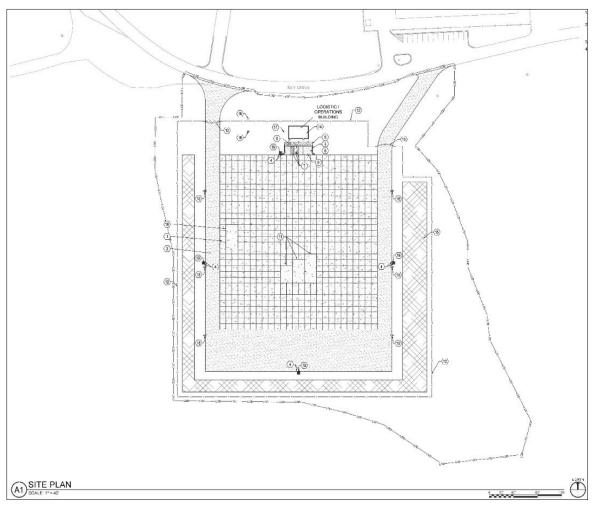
Conceptual Site Plan of the Line Haul Facility at Fort Hood
